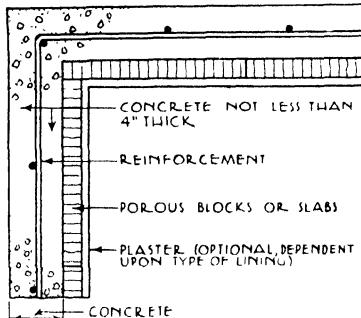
WALL HAVING LINING OF POROUS PLASTER OR SLABS
